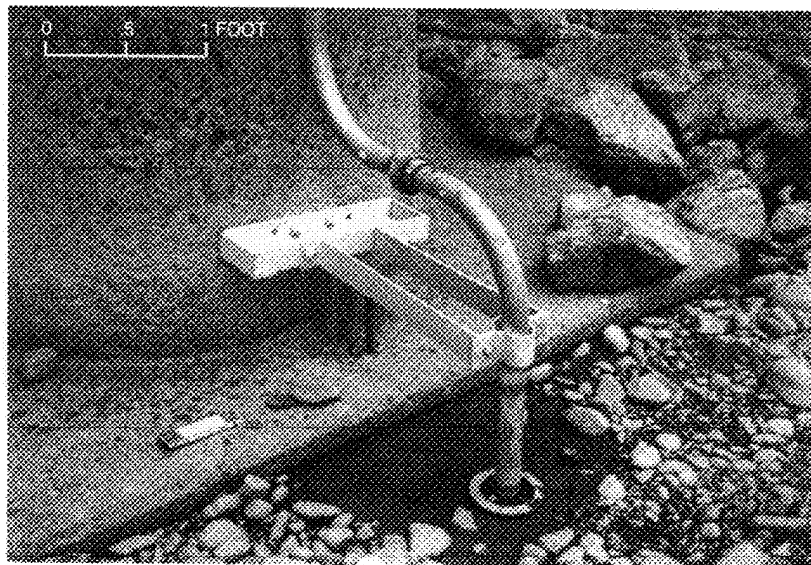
Sliding collar installed upstream of bridge pier at State Route 30/145 over Schoharie Creek at Middleburg, N.Y.
